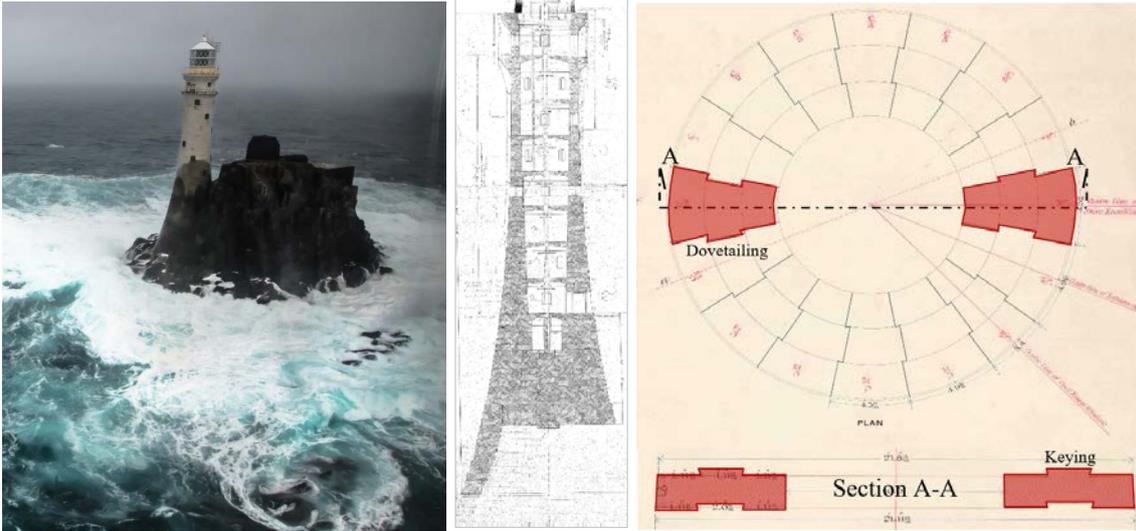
Fastnet lighthouse: (a) aerial photograph, (b) original section drawing and (c) details of dovetailing and keying for a course of stones.
